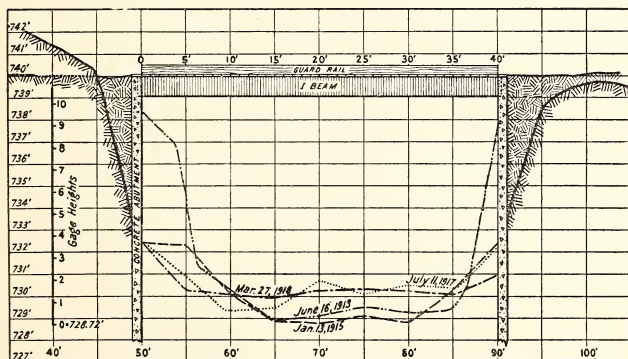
GAGING STATION AT MCHENRY'S BRIDGE, FACING DOWN STREAM
